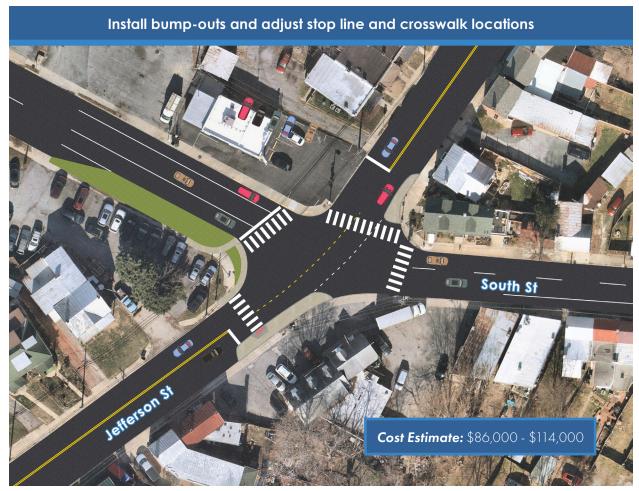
Proposed Improvements for Jefferson St and South St Intersection
